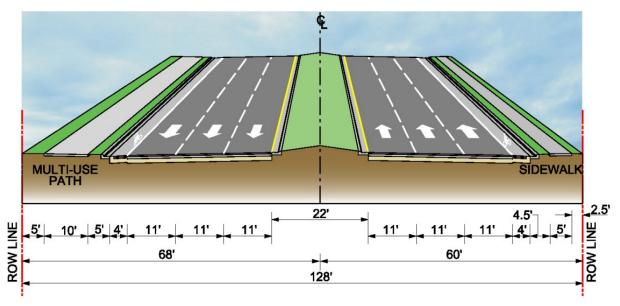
SIX-LANE DIVIDED URBAN TYPICAL SECTION FORT KING ROAD TO US 301
